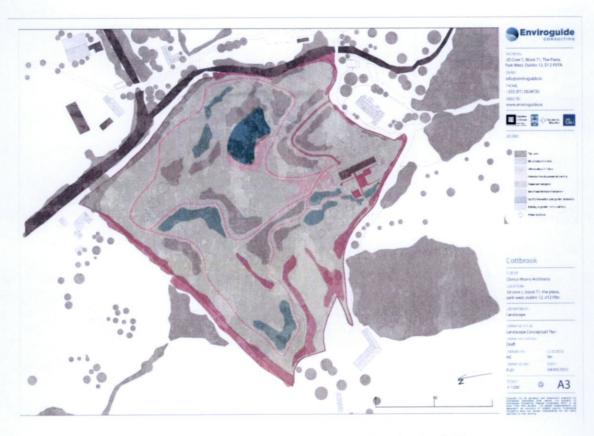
Proposed 20 years Landscape Conceptual Plan (Drawing P-01)
